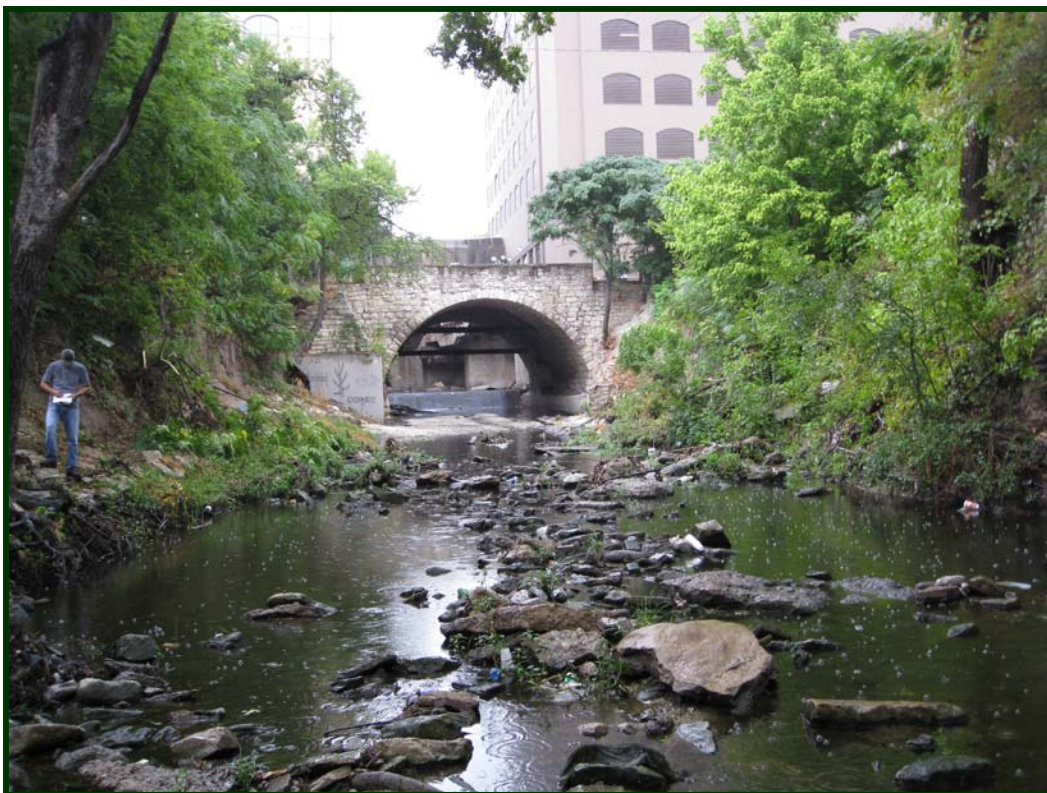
~ 5TH STREET BRIDGE, LOOKING UPSTREAM
